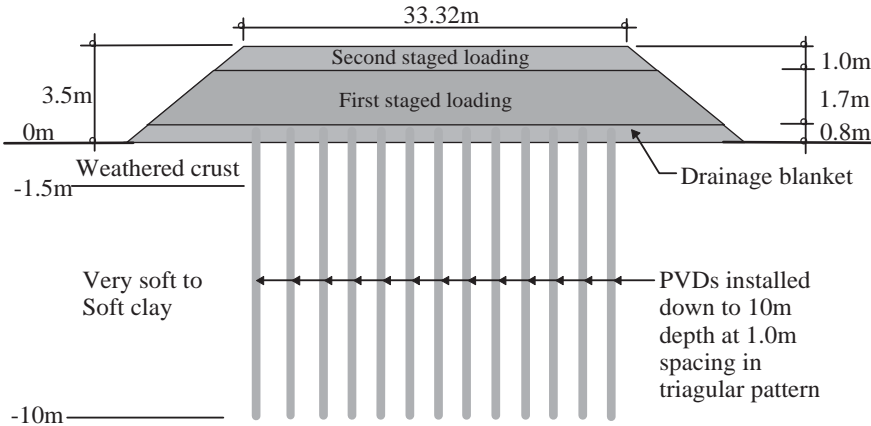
Section of type II embankment at the Landside Road System of SBIA project.
